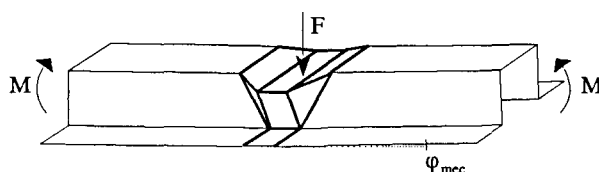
Plastic hinge mechanism in a cold-formed hat section
